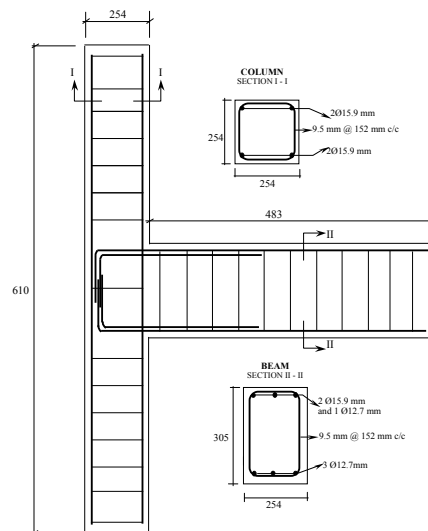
Geometry and reinforcement details of exterior beam-column joint tested by Bayasi and Gebman (2002)
